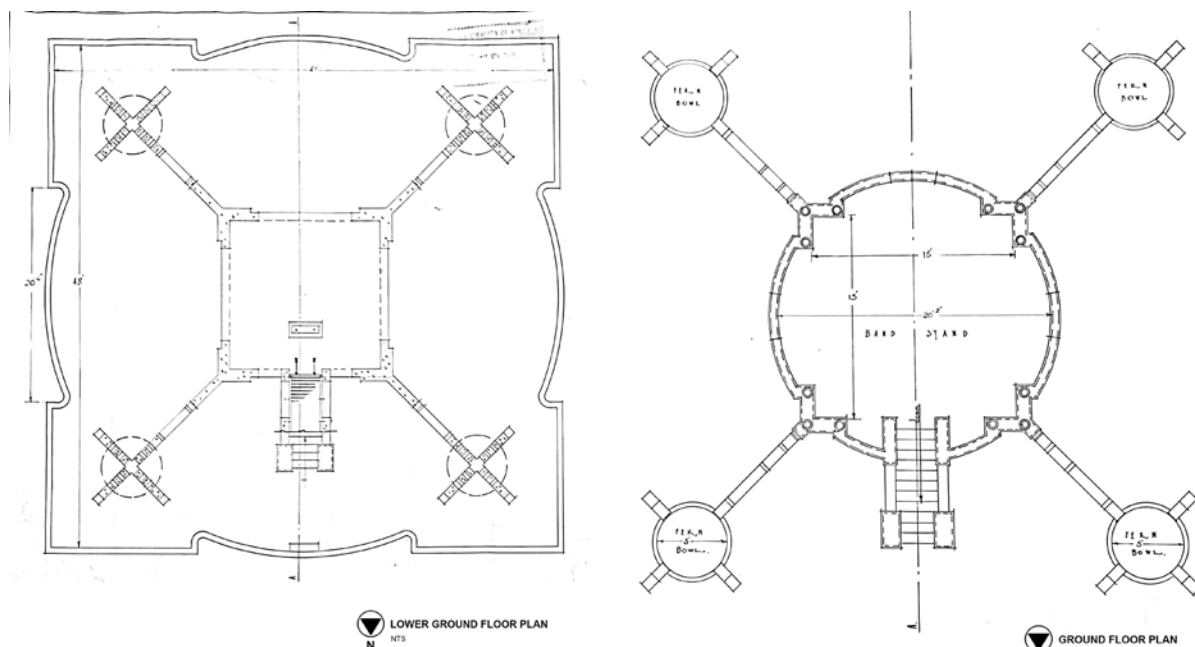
and 2.12: Ground and lower ground floor plans of the winning design by Walsh, 1929.
